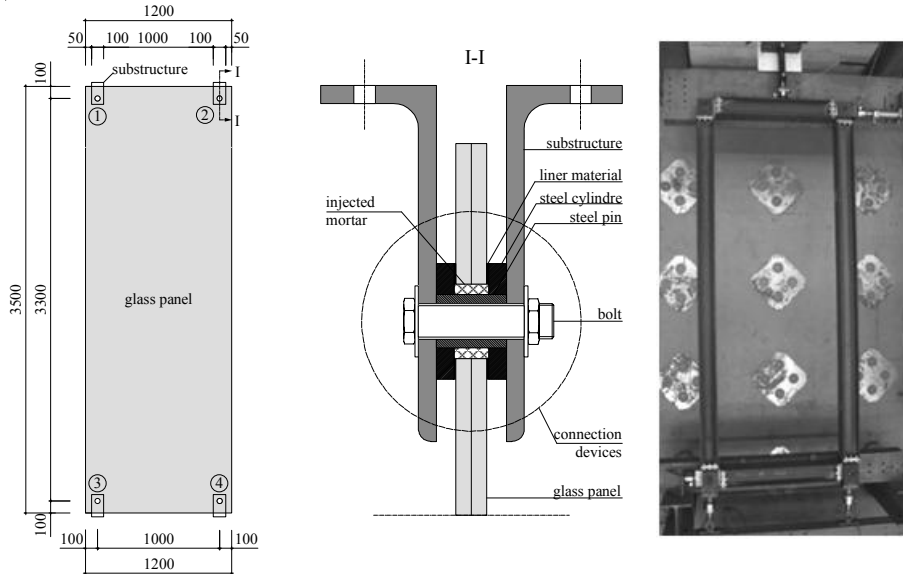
One-point supported panel test: specimen, substructures and testing frame [12].
